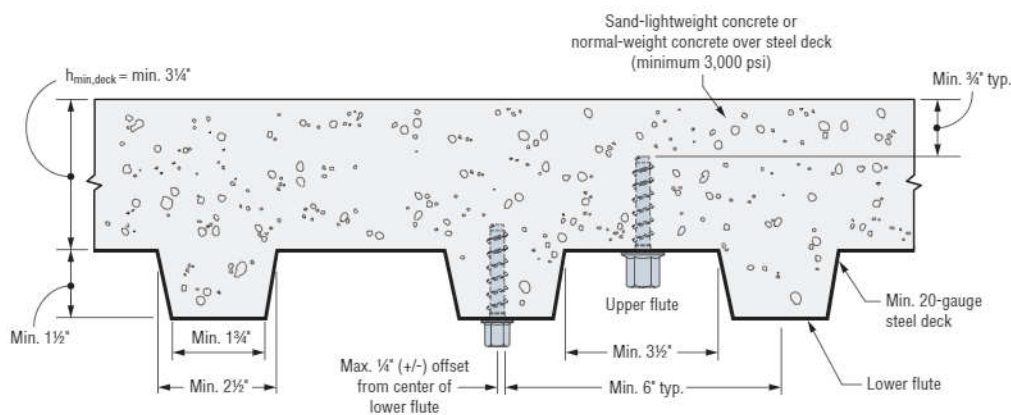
THDB25158RH and THDB37158RH Installation in Concrete over Metal Deck
